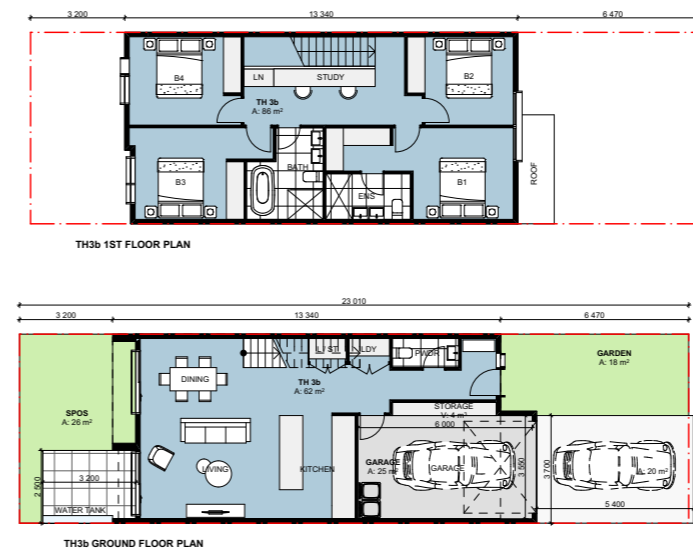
Townhouse Type 3b (Source: Plus Architecture)
